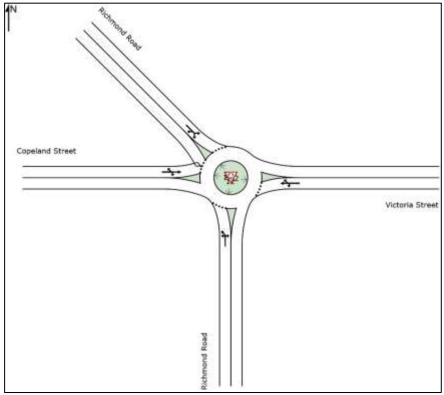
Roundabout intersection of Victoria Street with Copeland Street and Richmond Road (SIDRA)
